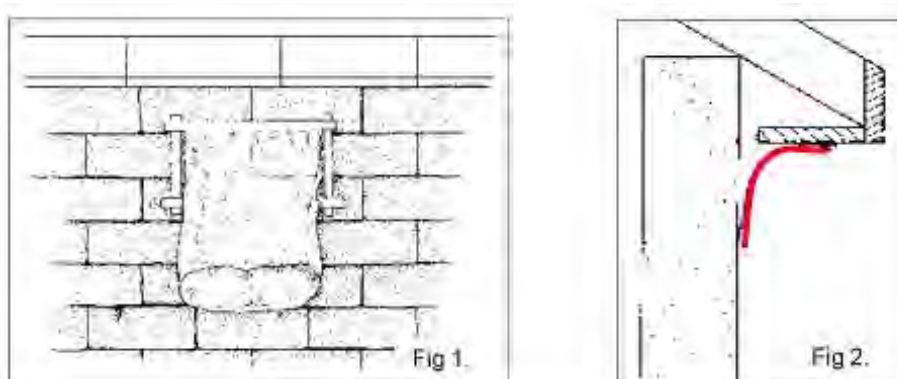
Constantine device constructed from polythene sheeting rolled into a tube / cone using double sided cello tape and attached to surface using gaffer tape.
